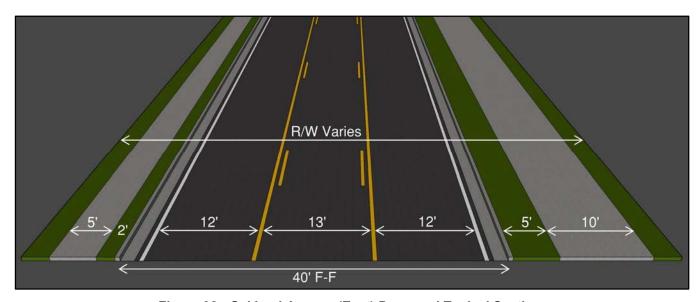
Oakland Avenue (East) Proposed Typical Section
